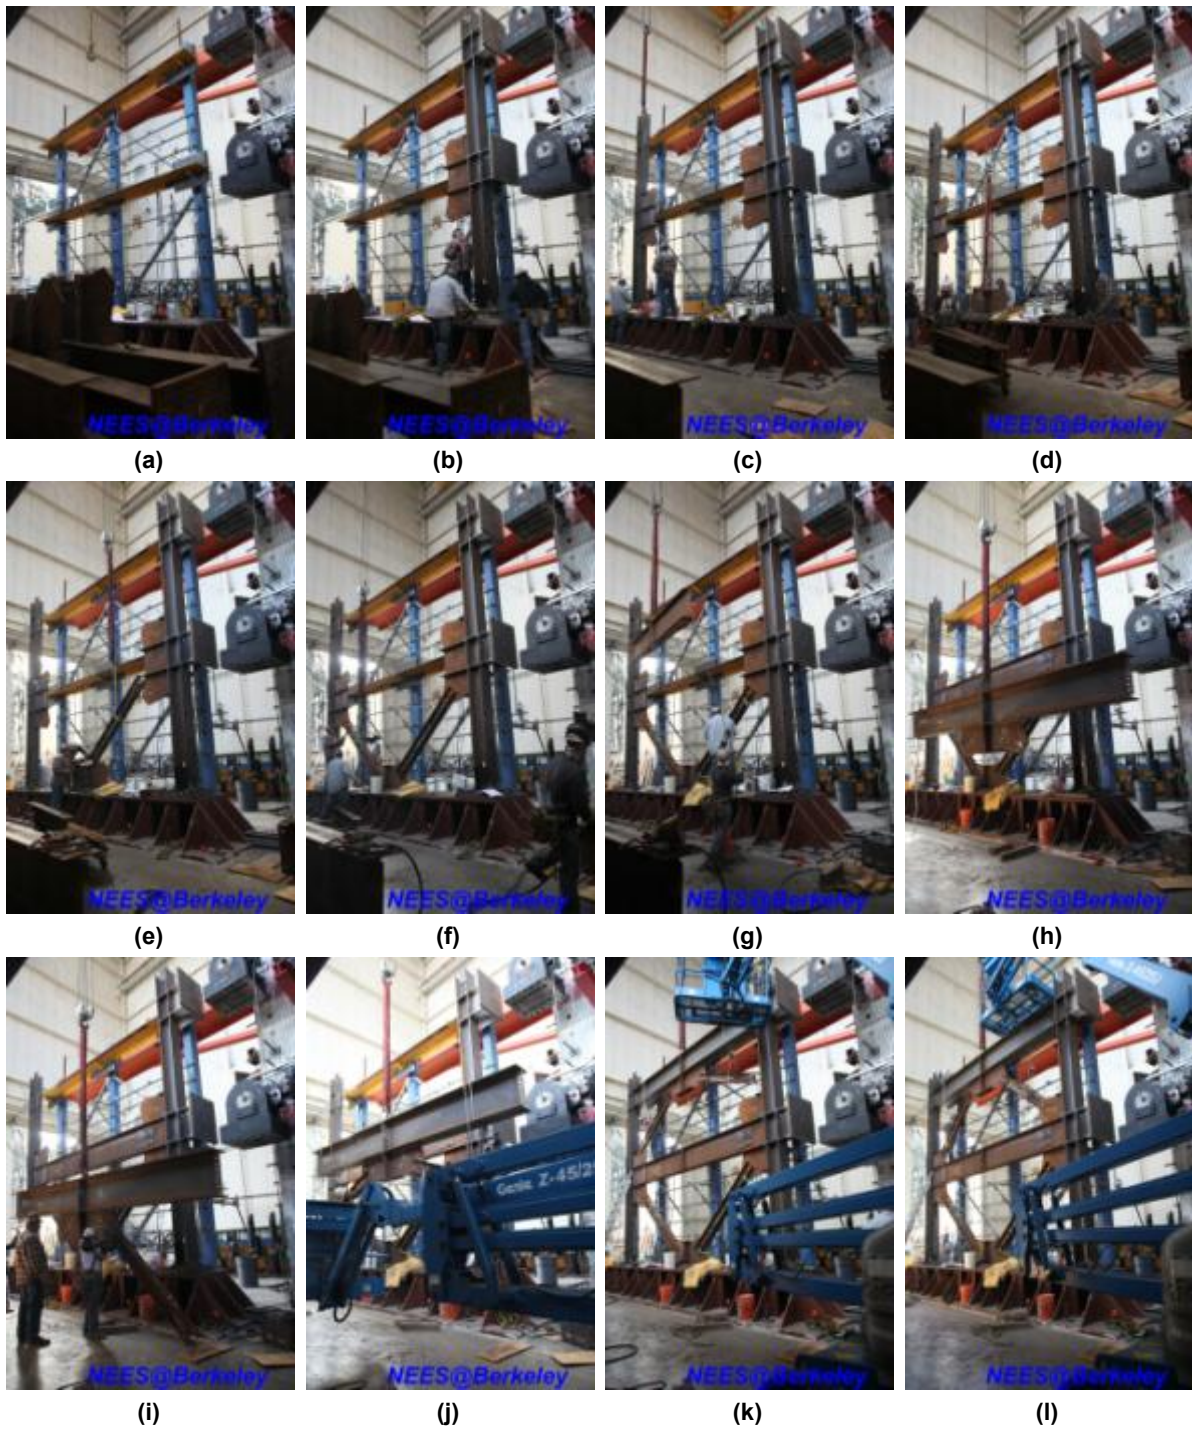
Specimen TCBF-B-3: key construction steps.
